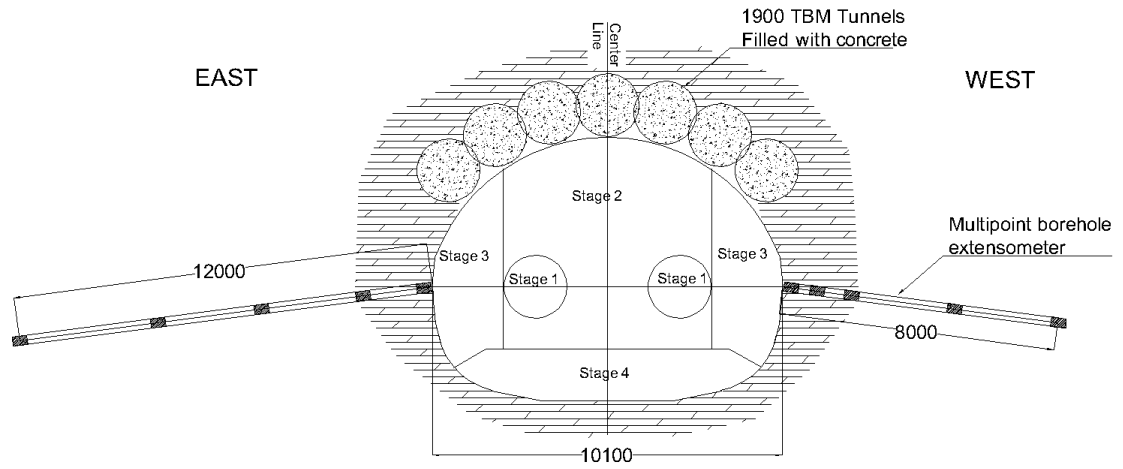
Billy Bishop Pedestrian Tunnel typical section (Dimensions in mm).
